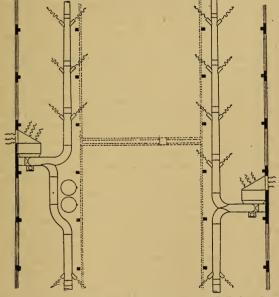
Typical Arrangement of Heating and Ventilating System for Foundry with Unobstructed Craneway.
